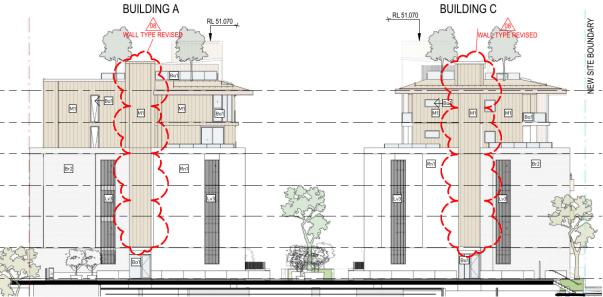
Comparison of approved plans to change material from timber aluminium cladding to raised/receded metal cladding with change of wall type for the stair wells.
